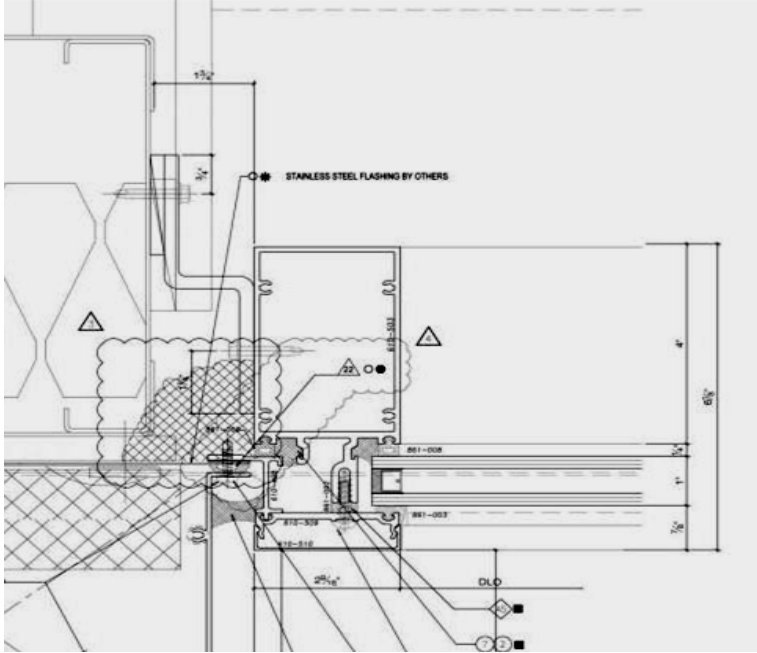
Plan detail of a jamb of an exterior curtain wall. Note the fixed side attachment of the glazed curtain wall jamb mullion to the adjacent light gage metal framing. See also Figure 11 and 12.
